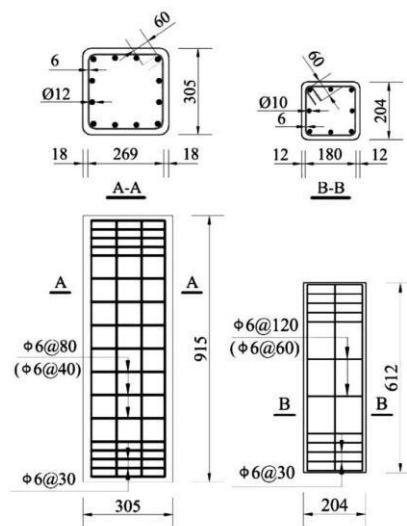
Specimen dimensions and reinforcement details of the columns by Wang et al. [6]
